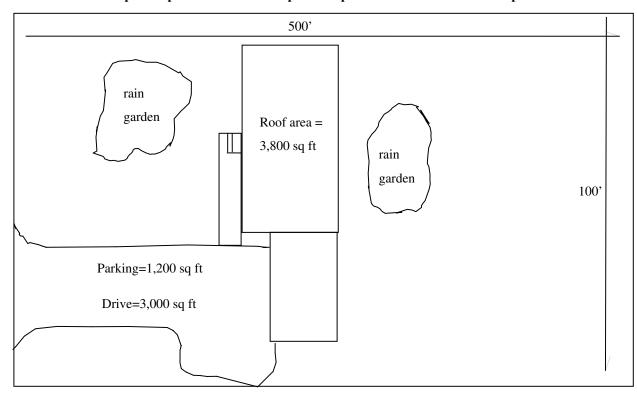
Sample site plan that meets exemption for post construction stormwater plan
